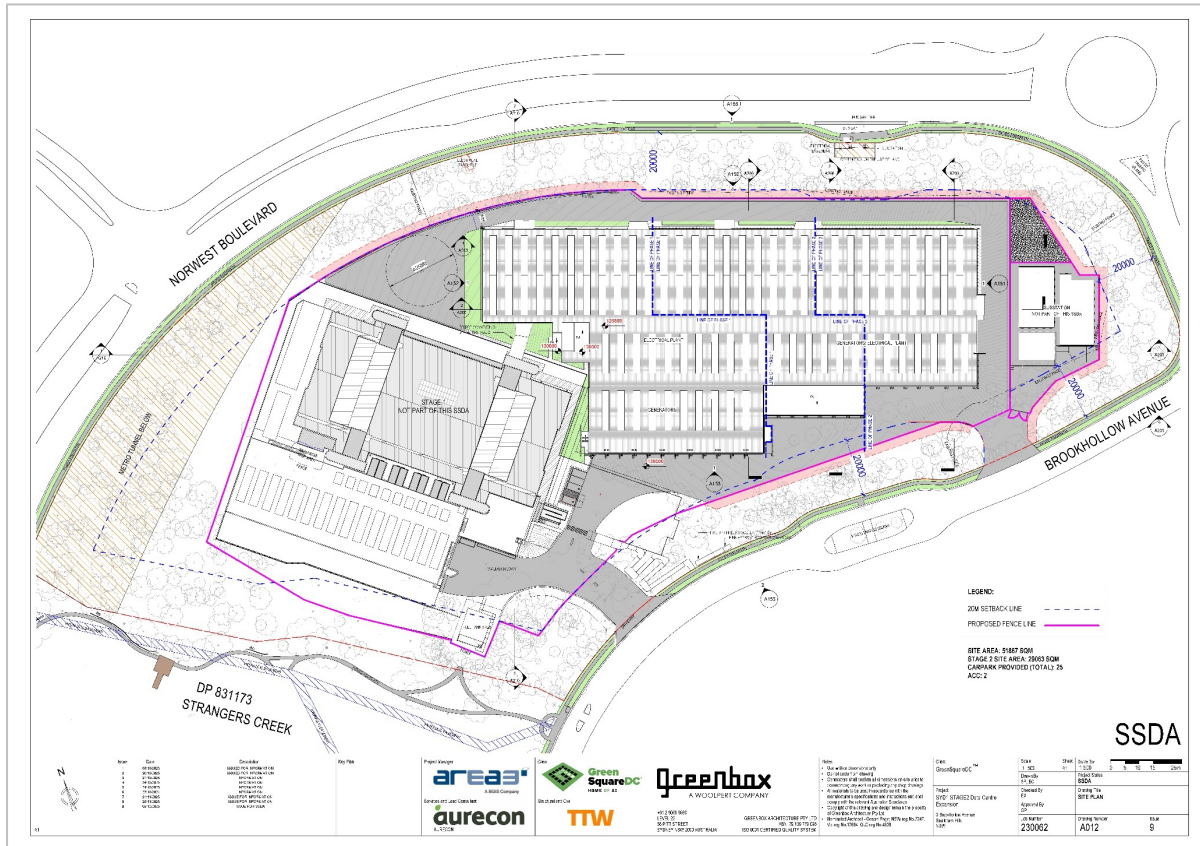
Site Plan (Source: Greenbox. 2025).
